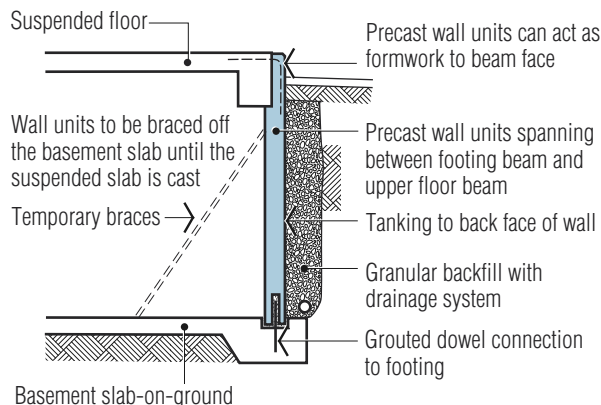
Precast retaining walls (after the *Precast Concrete Handbook*)
